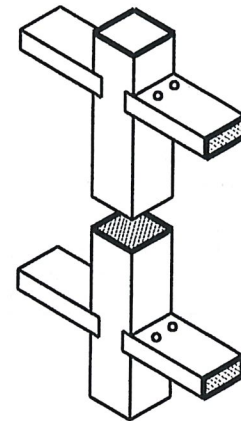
Exterior Connection: Top Rail Nailed to PostNotes:
